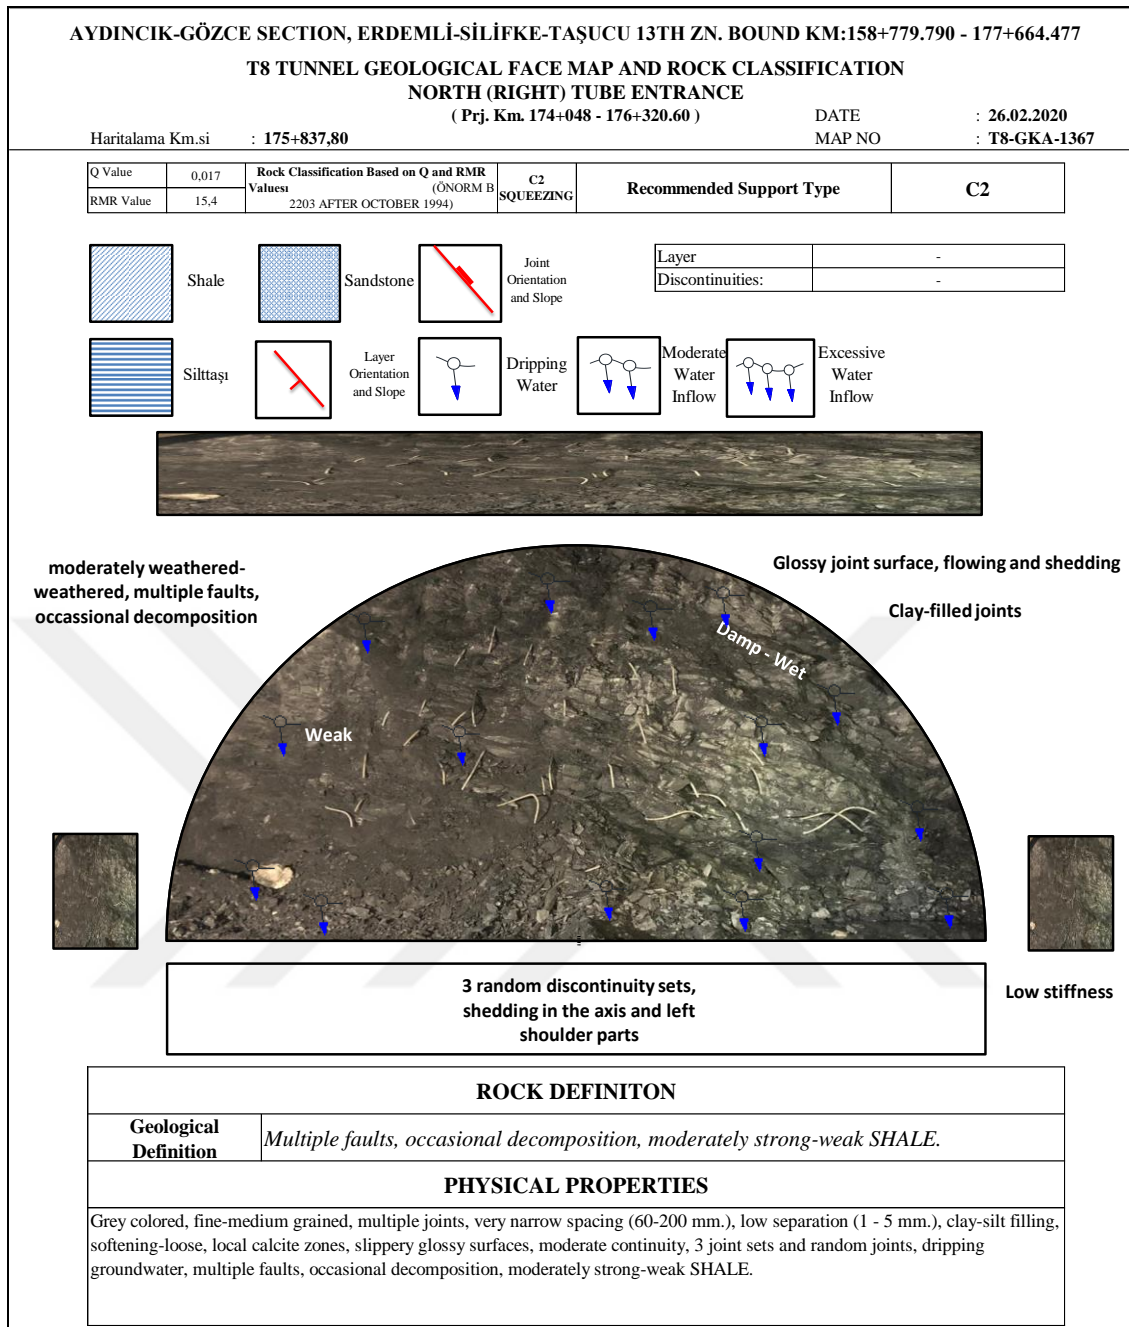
T-8 north Km. Q 0.017 and RMR 15.4 C2 rock tunnel face.
